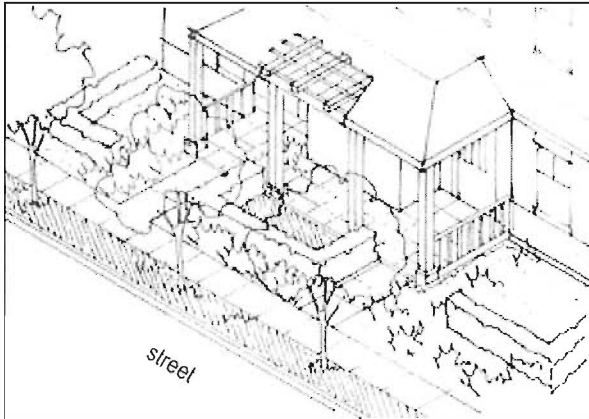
d.7. Residential development with a shallow setback from the street for multiple entries and small gardens
